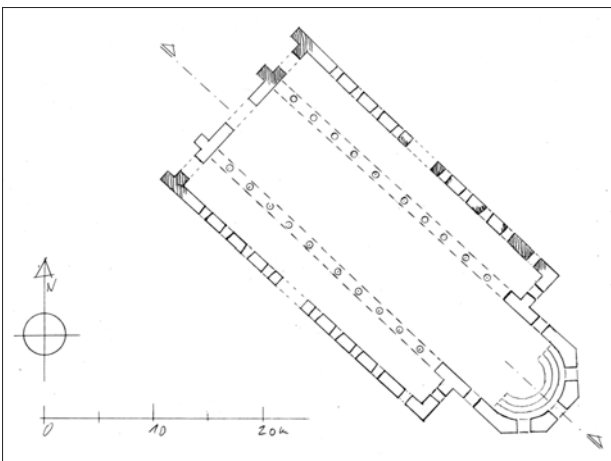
Germia, Church of St Michael: reconstructed plan of the early Byzantine phase one
